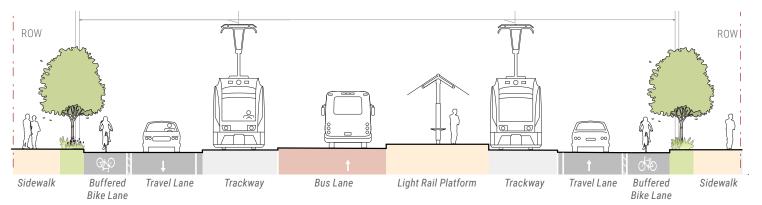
DRAFT Gibbs Street Station Cross Section
